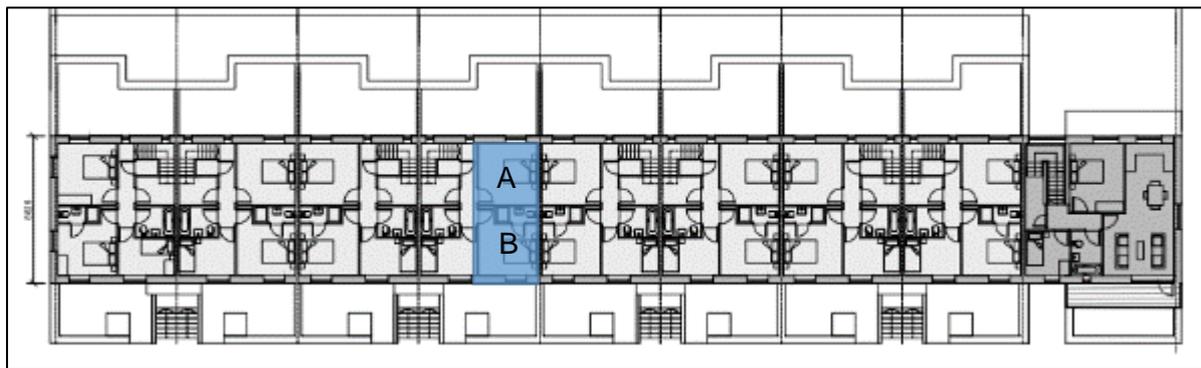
Block C2 – Second Floor Assessed Rooms Highlighted in Blue
